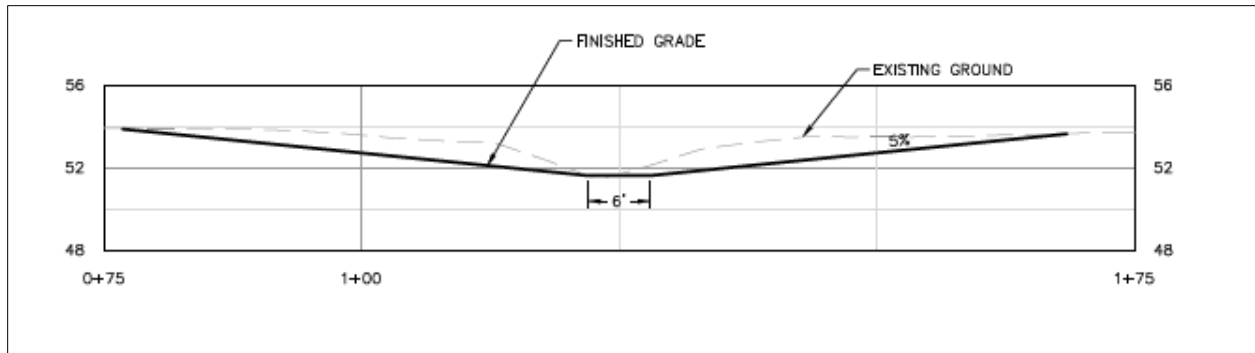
Design detail for connecting east-west flowing tributary channels that cross the project site.
